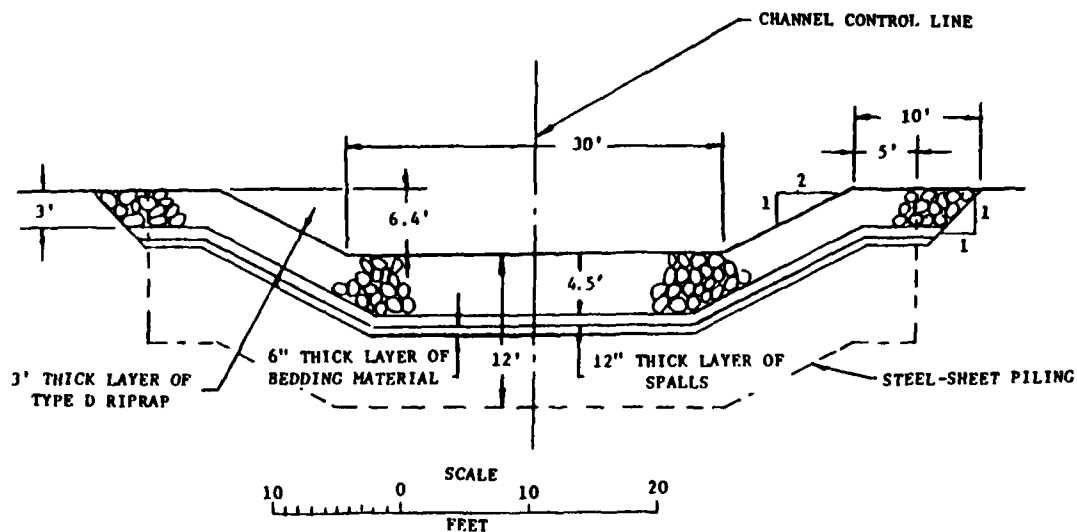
Little Blue River at Independence, Mo. Cross-sectional view of sheet piling and rock sills.
